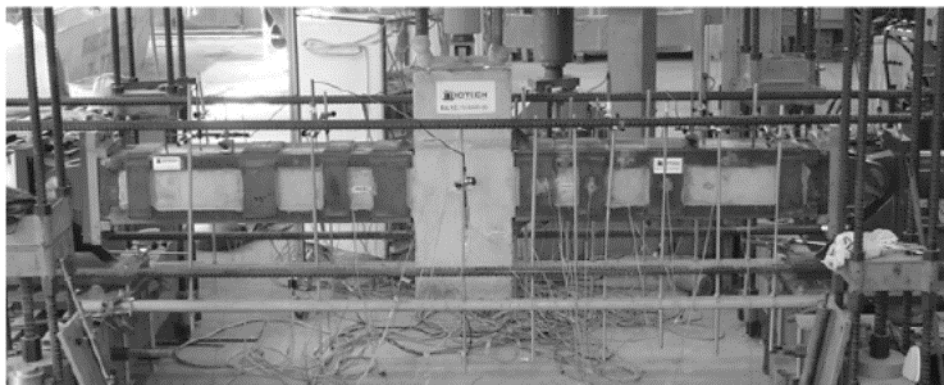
General view of the test specimen (Adam et al., 2008)
